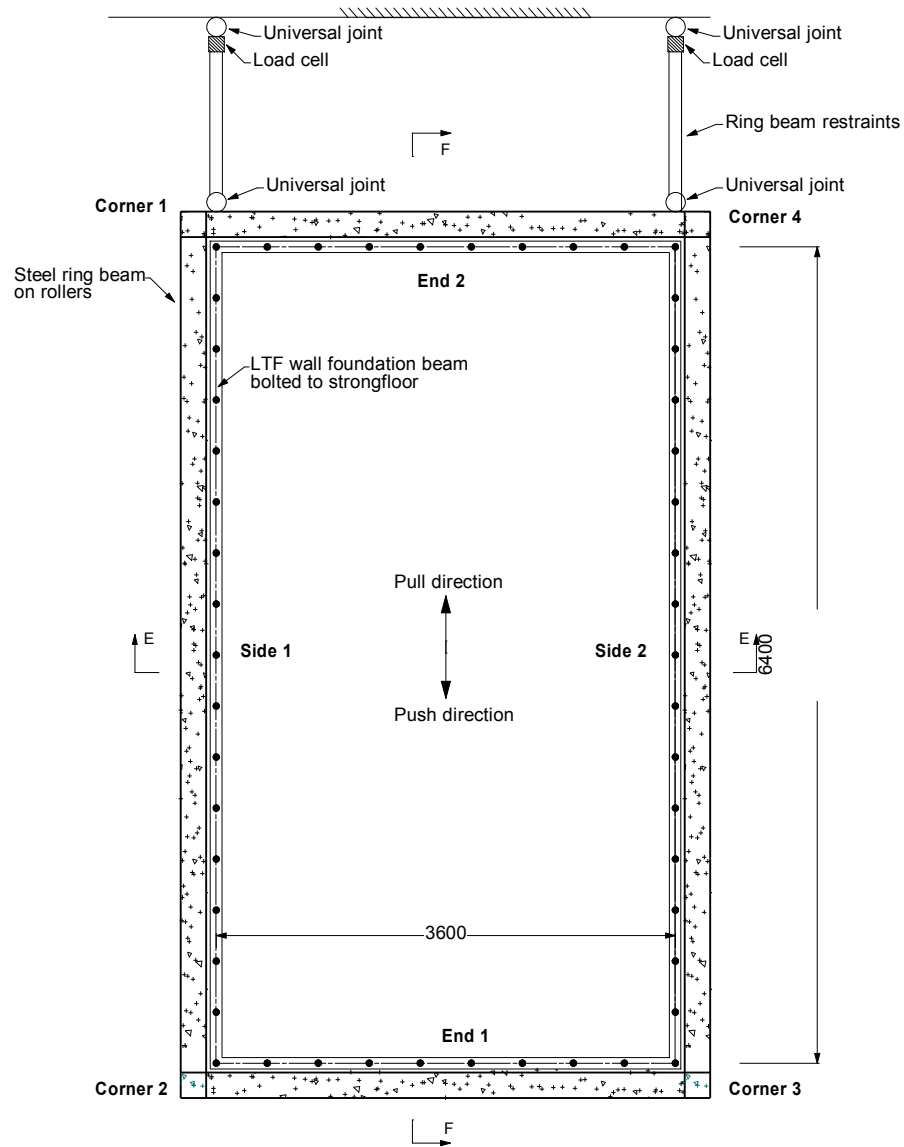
Plan view of building foundation ring beams supporting the veneer and the LTF foundation beams
